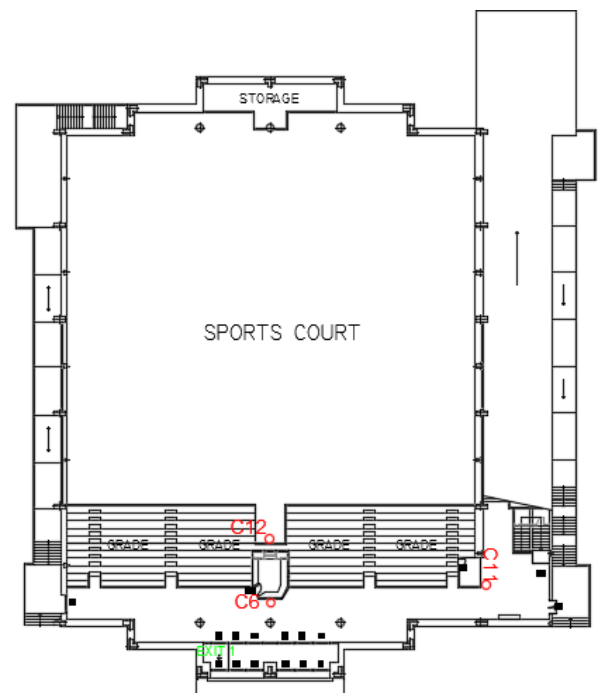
Plan of the main floor of the Sports Centre of the UC – (University of Cantabria, 2016)
